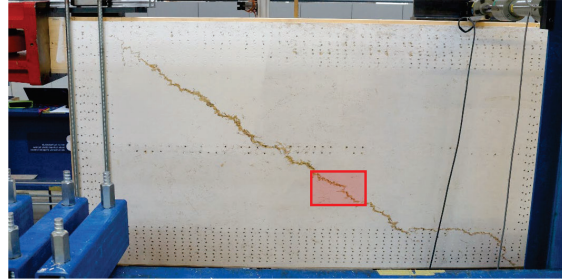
The initial failure of the 25-N-3 shear wall test occurred in diagonal direction in the field of the sheathing (marked in red).
